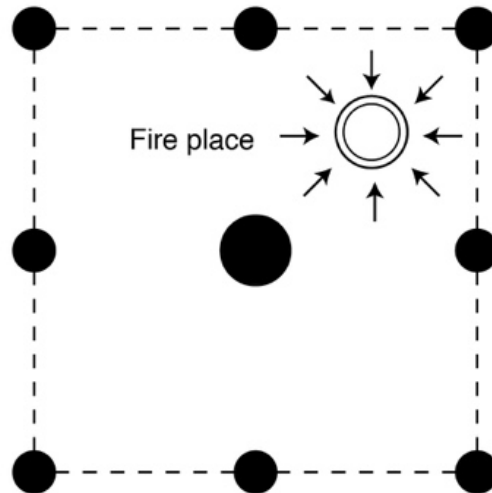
Fire place off the center, Shudong Drum Tower (Draw by author)
